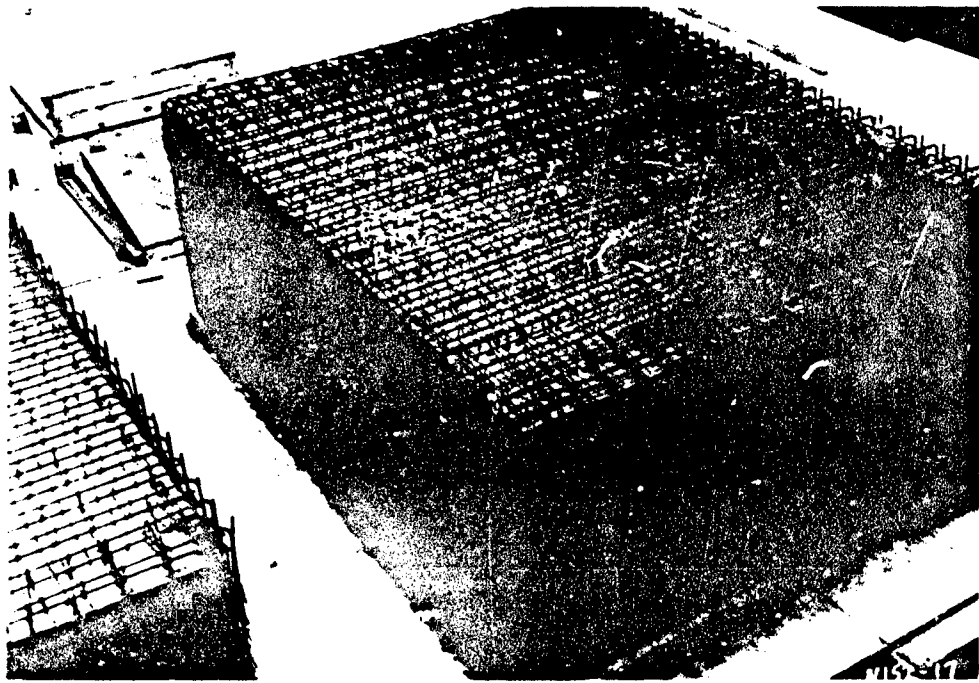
Type 1 element prior to placing outside forms and pouring the walls and roof.
